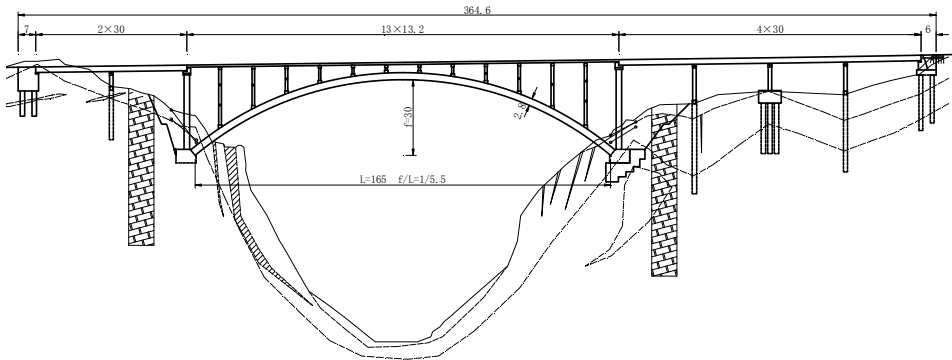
Elevation of MUPENG Bridge (unit : m).
